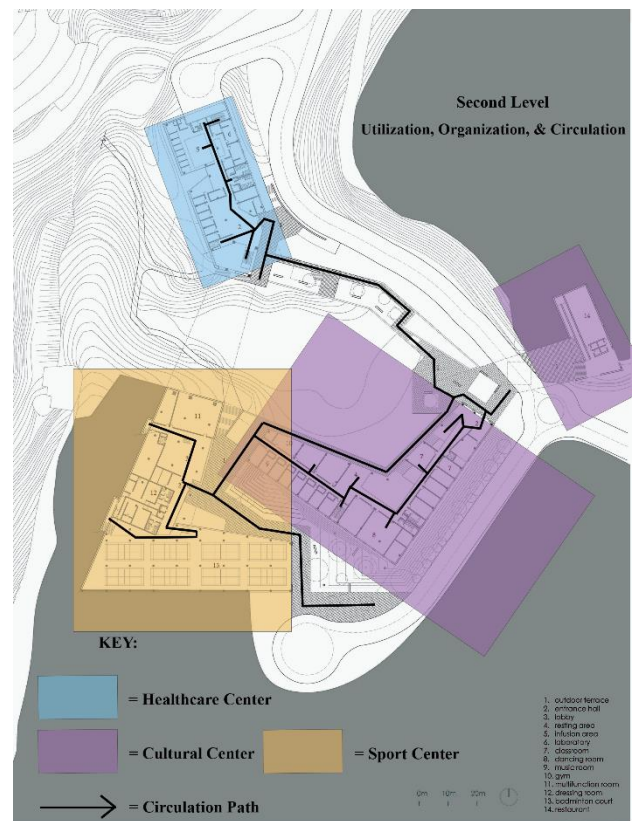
Chongqing Taoyuanju Community Center, Second Floor Plan. Adapted from Archdaily & Vector Architects
